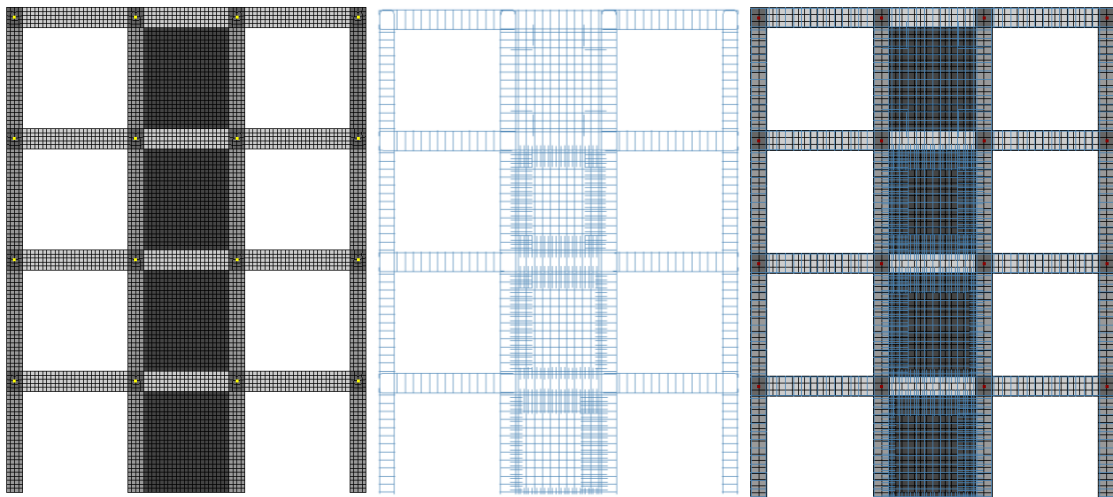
(a) Monolithic RC frame with RC infills with plane stress elements, (b) Embedded reinforcement bars for the existing frame and web reinforcements and dowels, (c) Complete FE model I (DIANA FEA BV, 2019)
